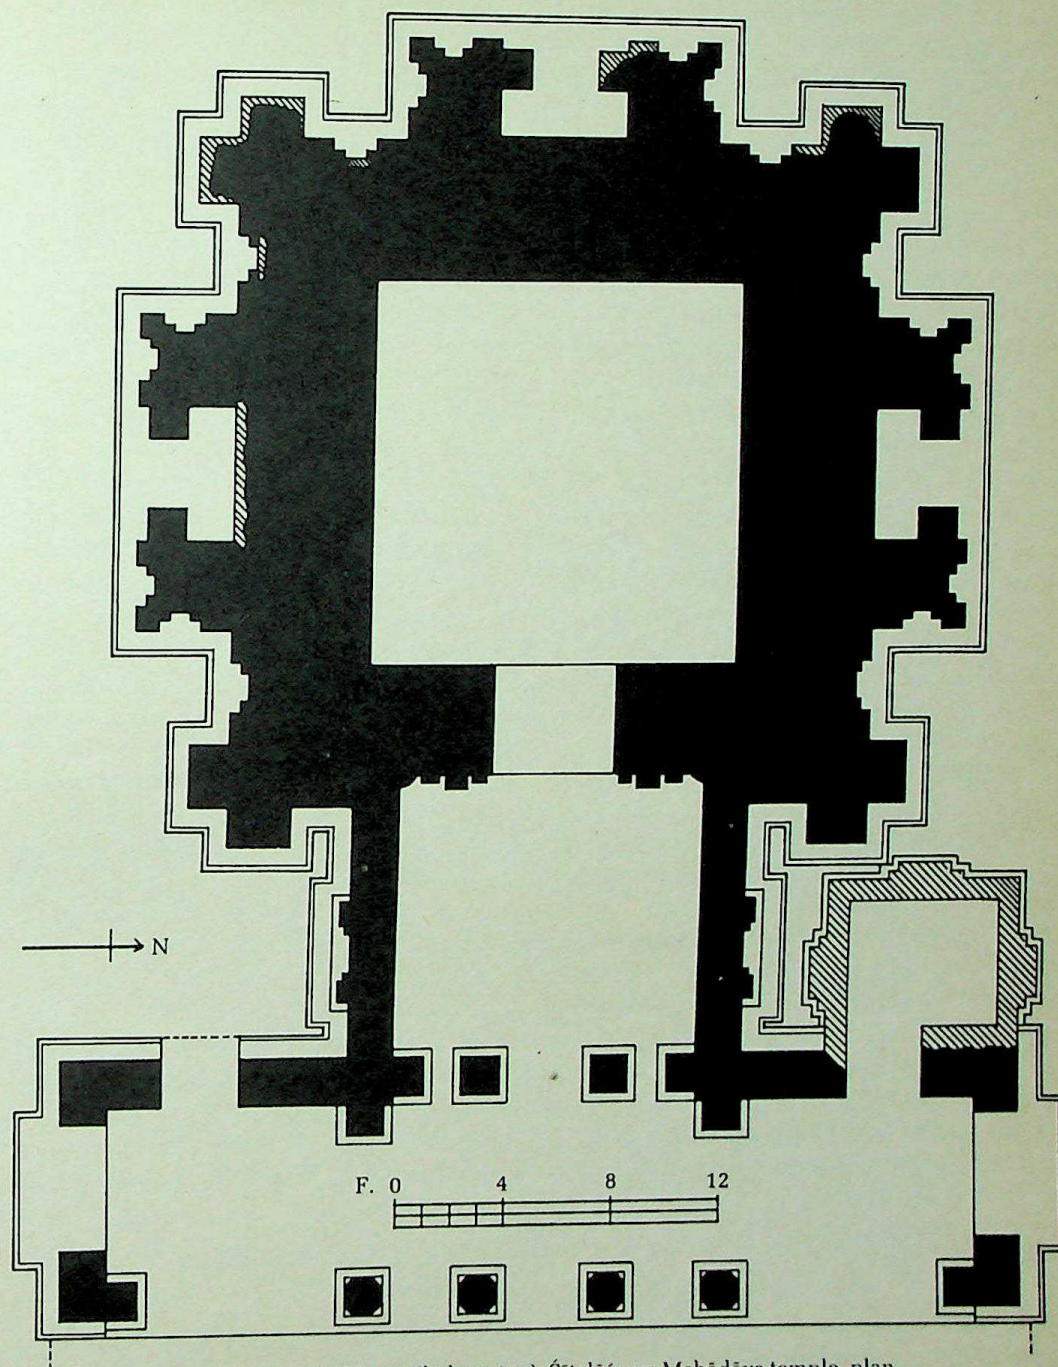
Candrabhāgā (Jhalrapatan). Śitalēśvara Mahādēva temple, plan.
